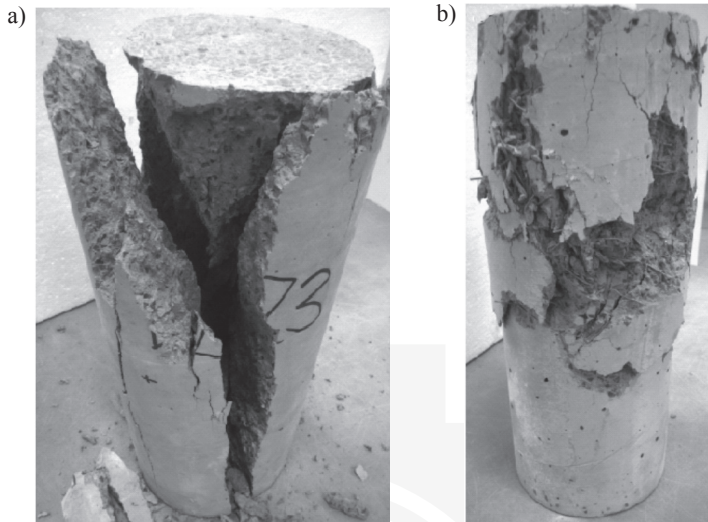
Typical failure modes of NCC (a) and FRCC (b)
